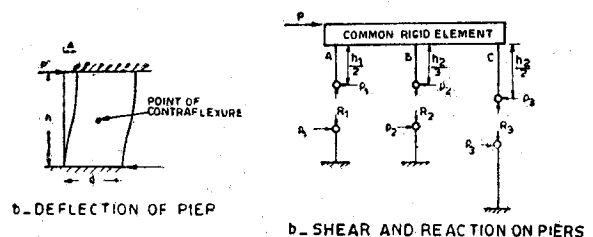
Behaviour of Shear wall as assumed in P.C.A. Method.
